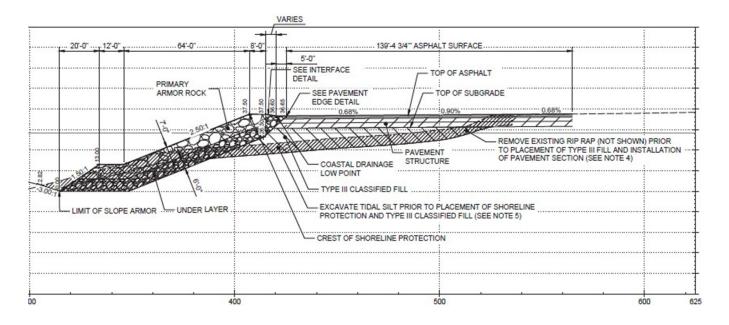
Generalized Cross Section of Dredge Area depicting proposed excavation and backfill
